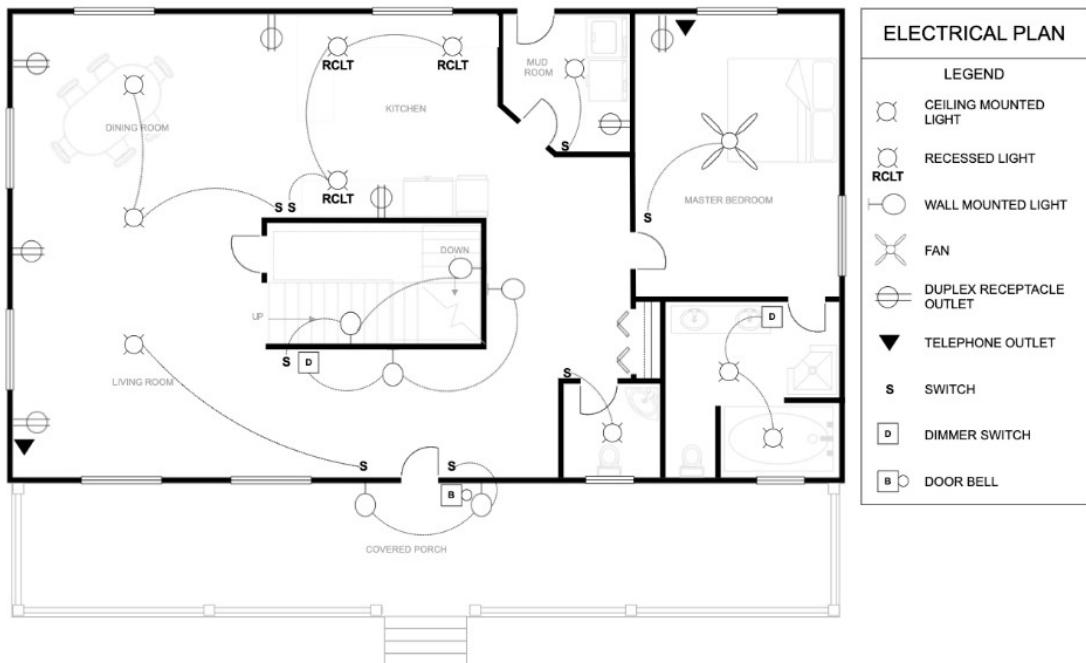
Electrical floor plan (Rashid, Algeelani, Al-Gailani, & Sariff, 2021)
